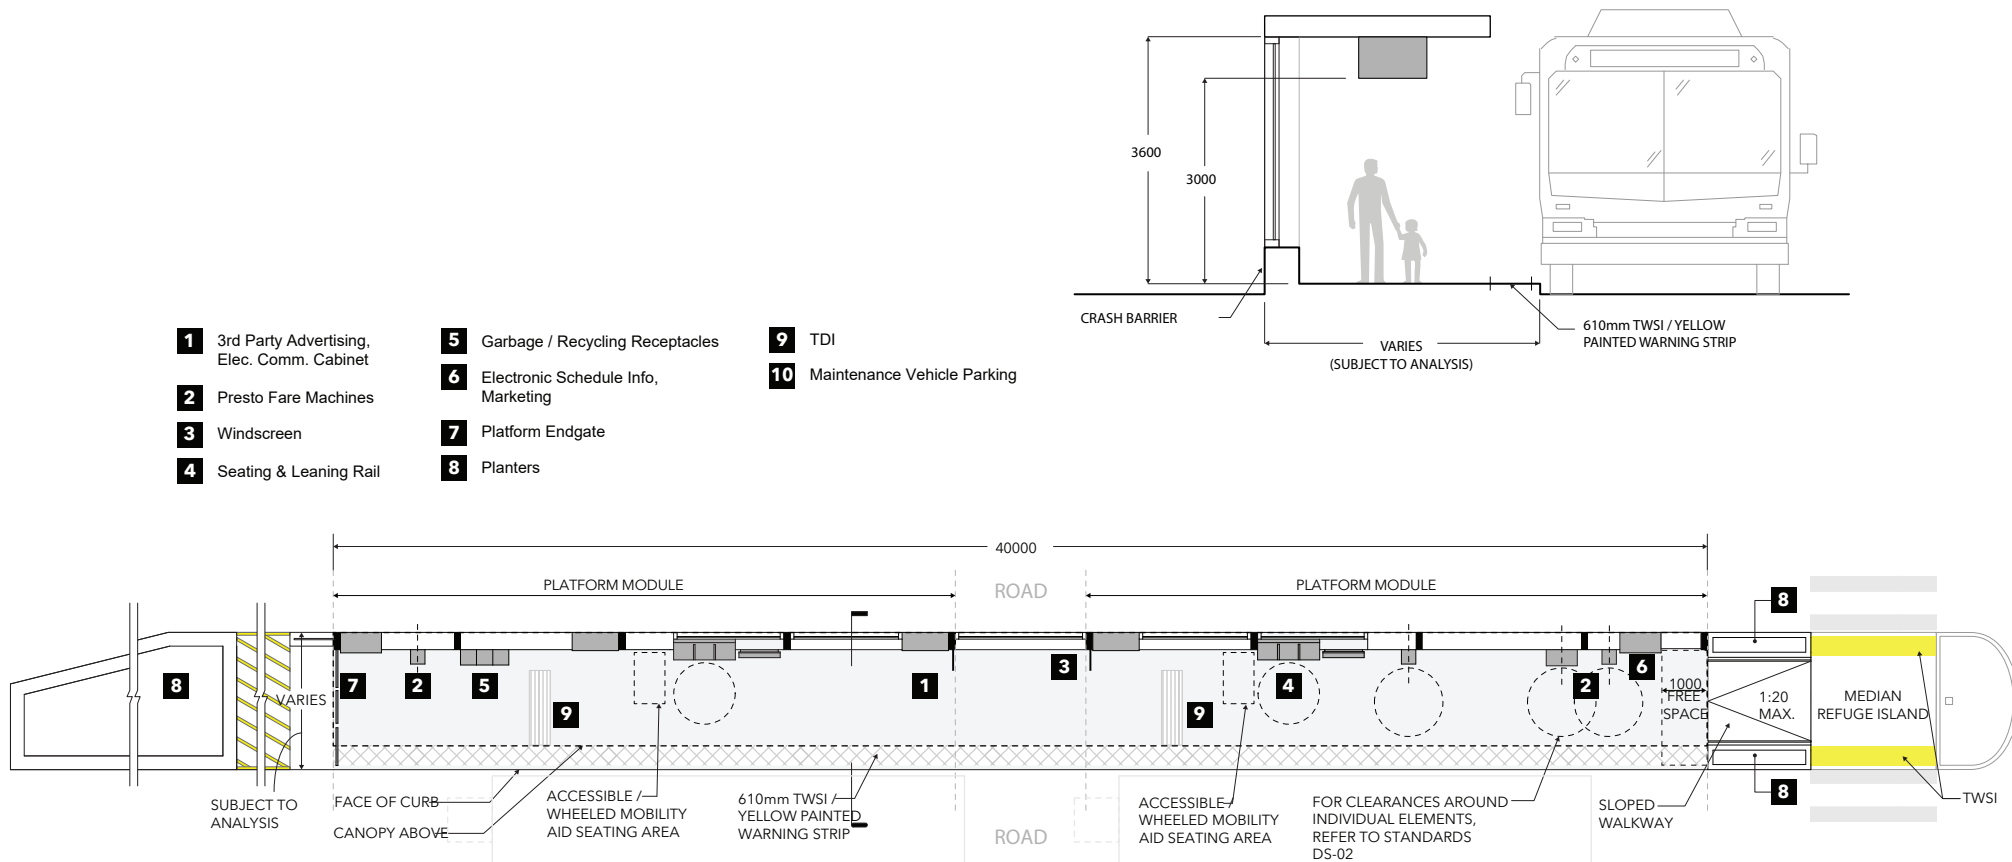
BRT shelter type 1 - low canopy, open shelter - median
